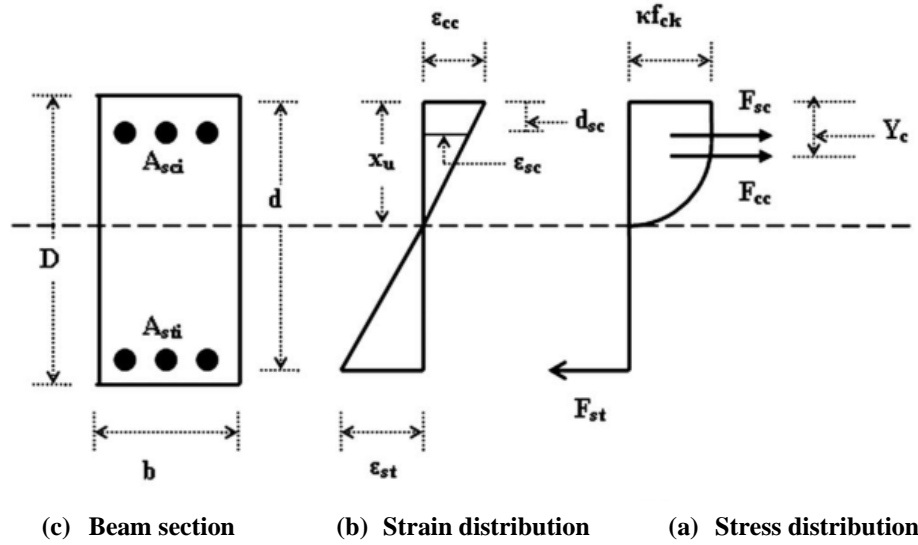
Derivation of the flexural strength of a corroded reinforced concrete beam (Bhargava et al., 2008)
